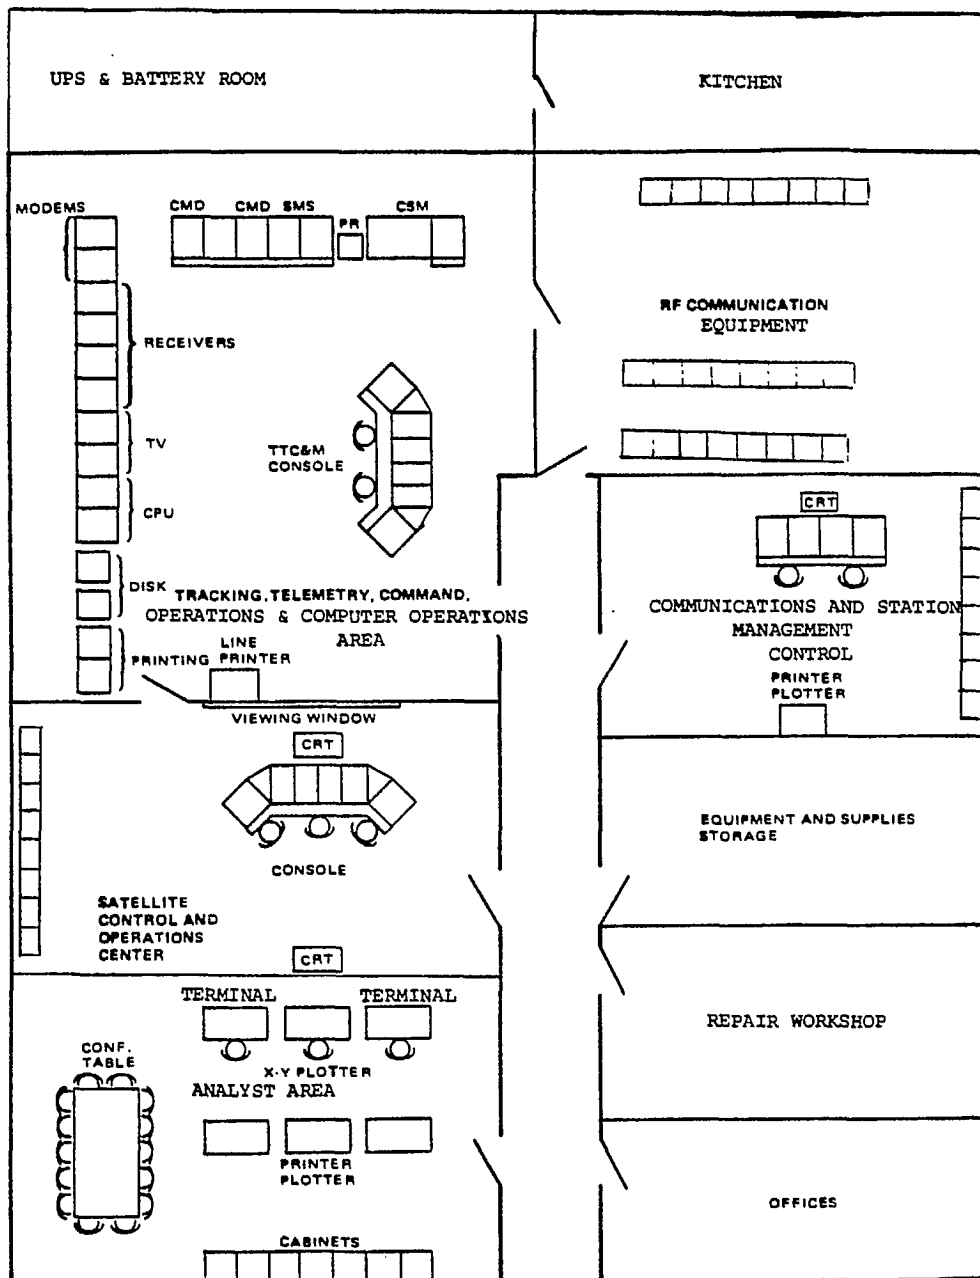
TYPICAL TT&C/SCC STATION LAYOUT
